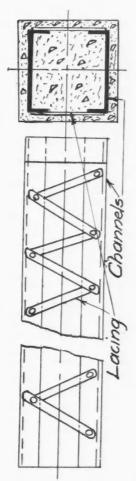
Square Column of Reinforced Concrete, Showing the Structural Shapes for the Case.
